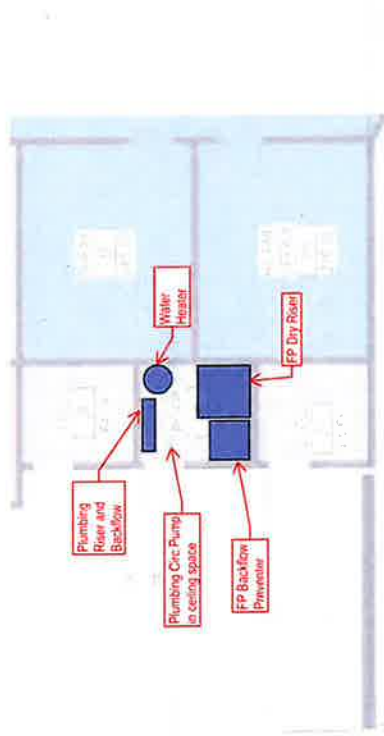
ENTRY BUILDING PLUMBING EQUIPMENT
